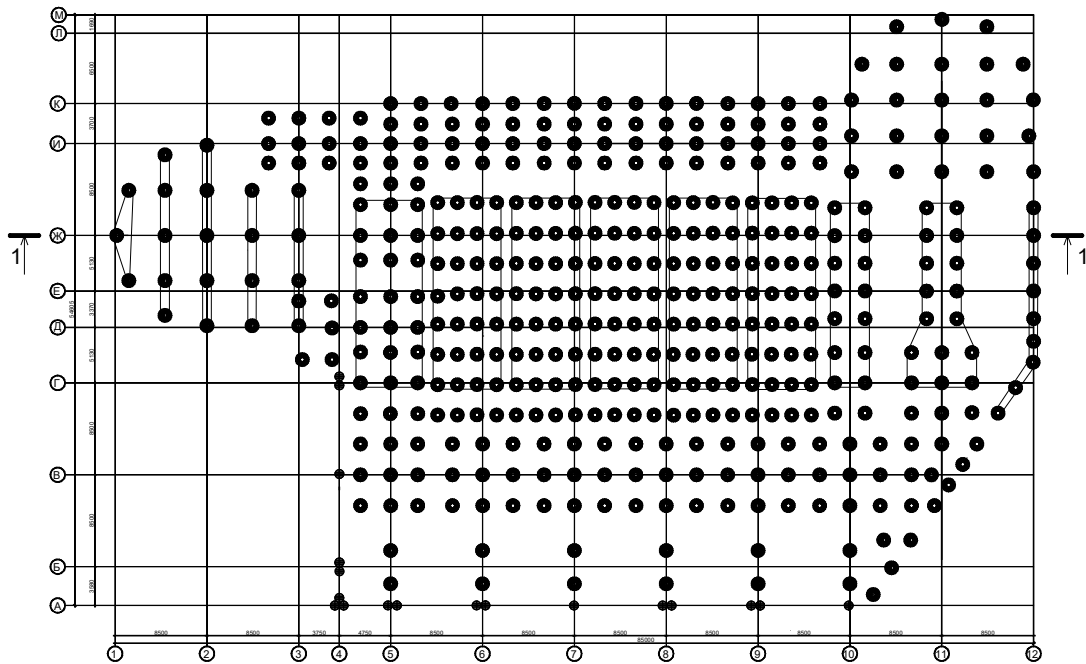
Plan of the pile field with equal pile lengths – Type 1
